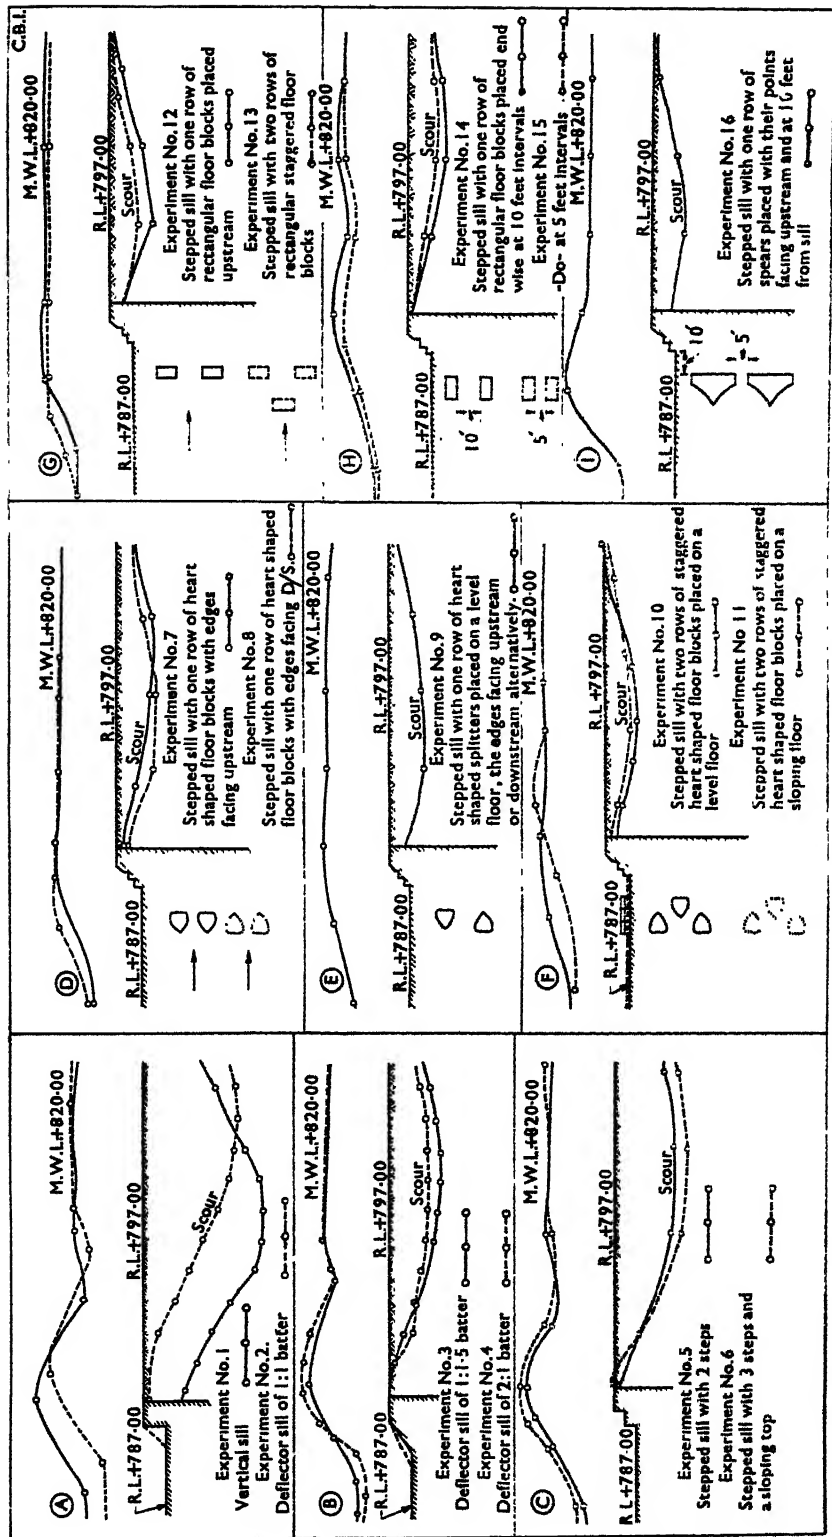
C.16:- Showing lower Bhavani Spillway Dam
